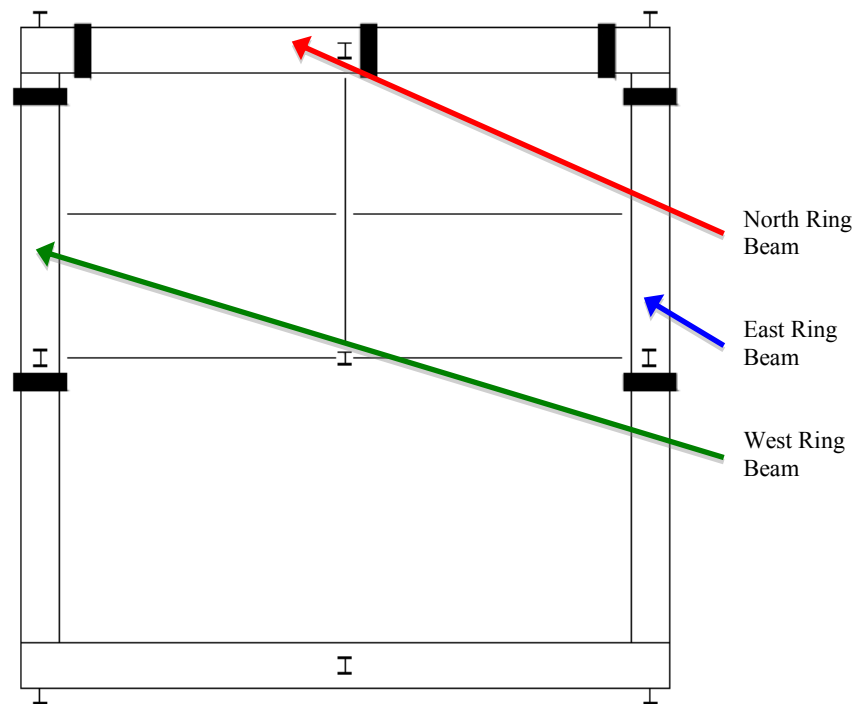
Plan View of Ring Beam Strain Gage Locations
